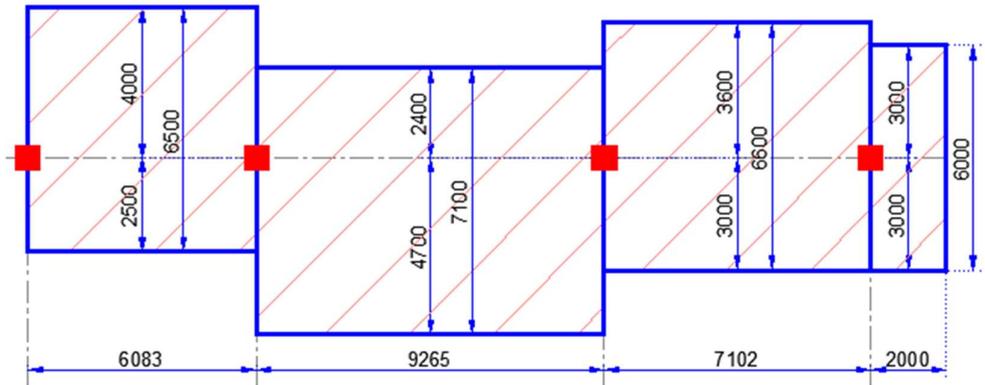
SLAB IDEALIZED STRIP DETAILS
